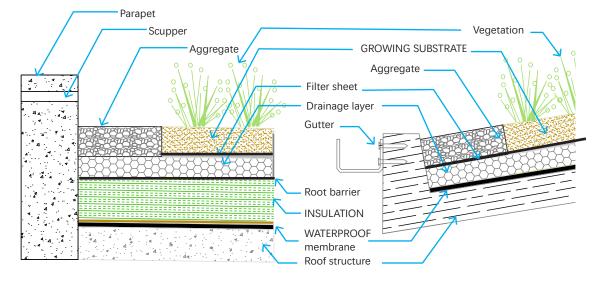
A.8(a): Roof Drain on a Flat Green Roof
